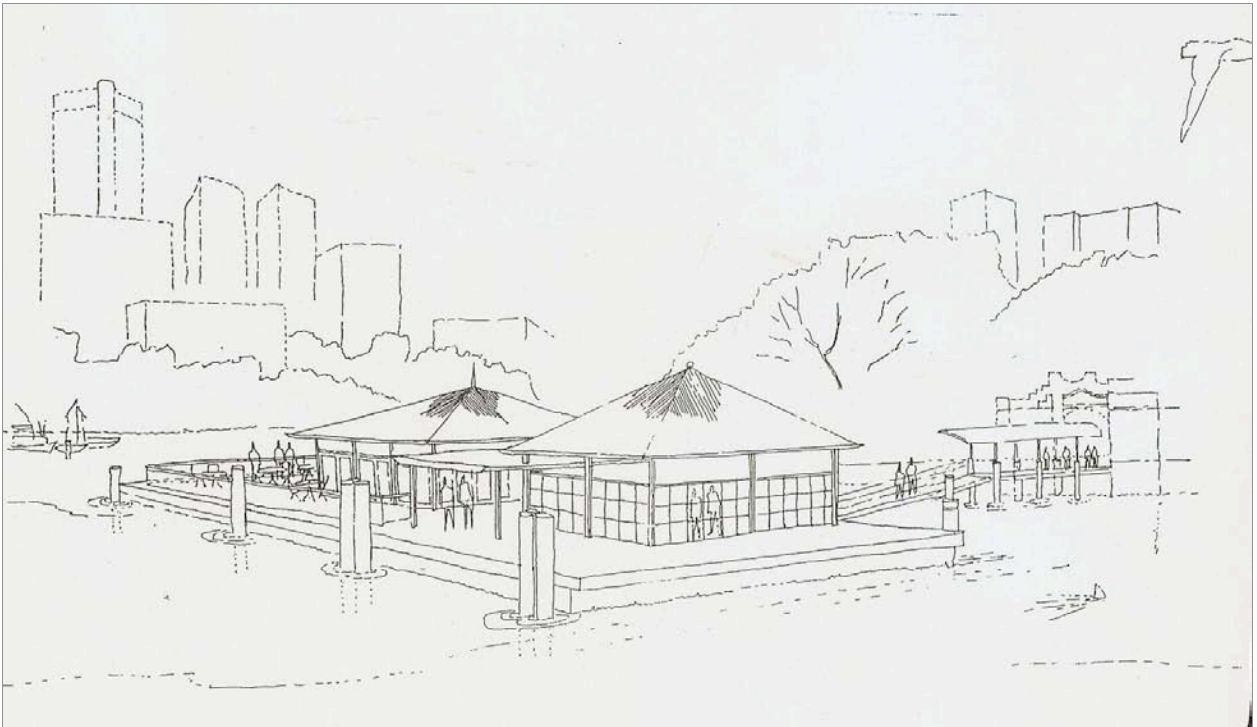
• The 1995 proposal to site a restaurant on a new Hayes Street wharf. The plan shows how the new wharf would be configured, with a waiting and restaurant pavilion. Source: NSC Stanton Library photograph collection.
